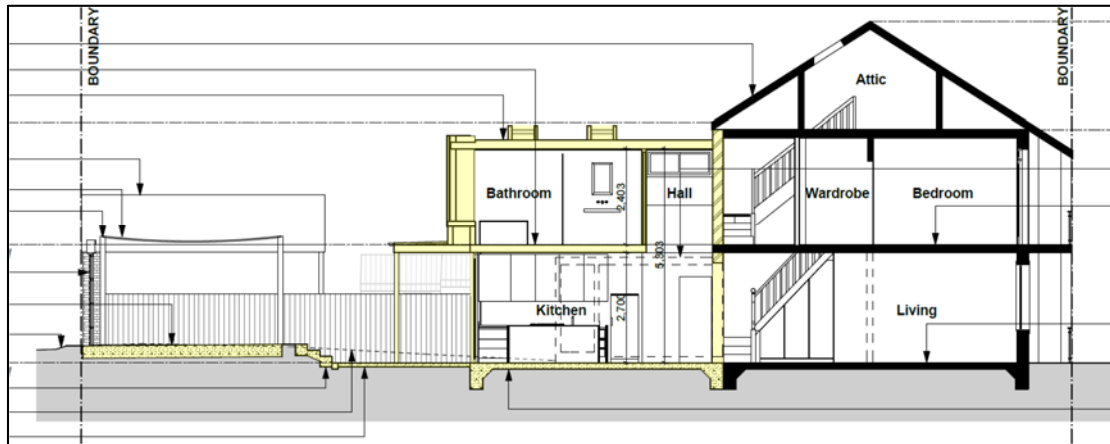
Example of additions to single storey terrace in a conservation area in the City. The additions ground floor extension, attic conversion, rear roof addition and a rear garage with a studio. The proposed FSR was 0.83:1 and less than the 1.5:1 control.
